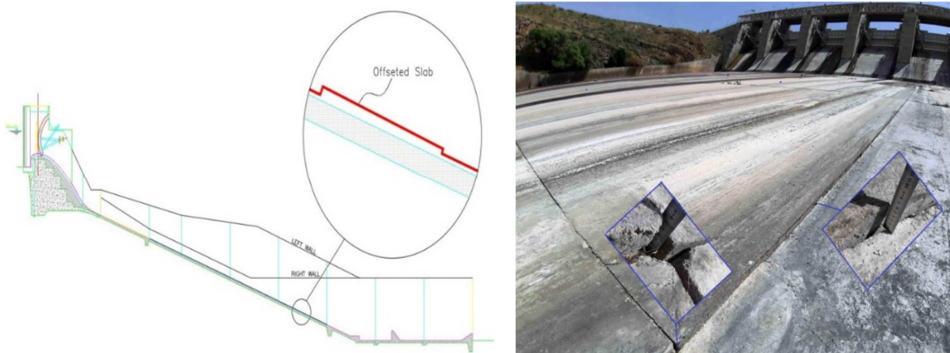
Location of joints and vertical offset of concrete panel of Bukan spillway
